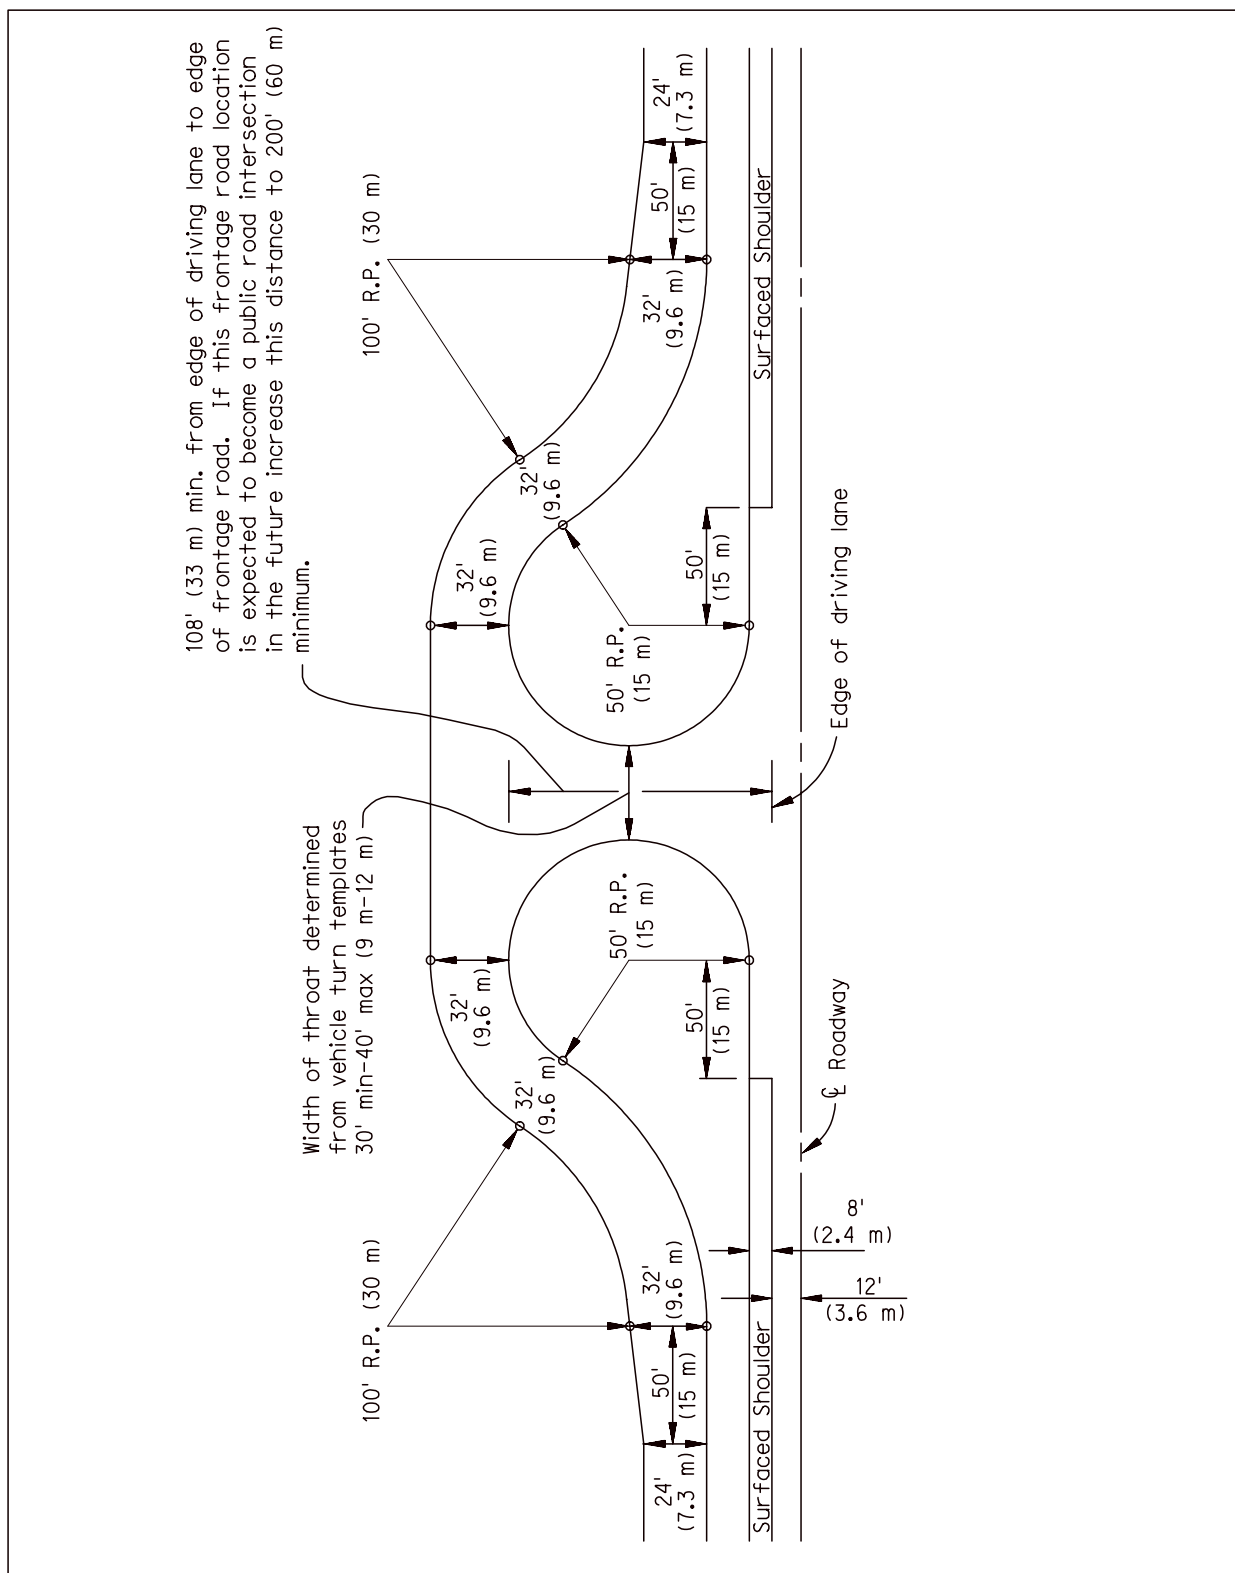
Typical Frontage Road Connection off of a Major Roadway
